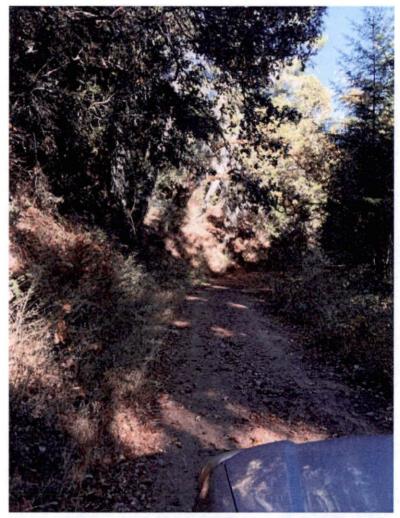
10'-wide travel way, no shoulder, gravel surface, no inter-visible turn outs.
